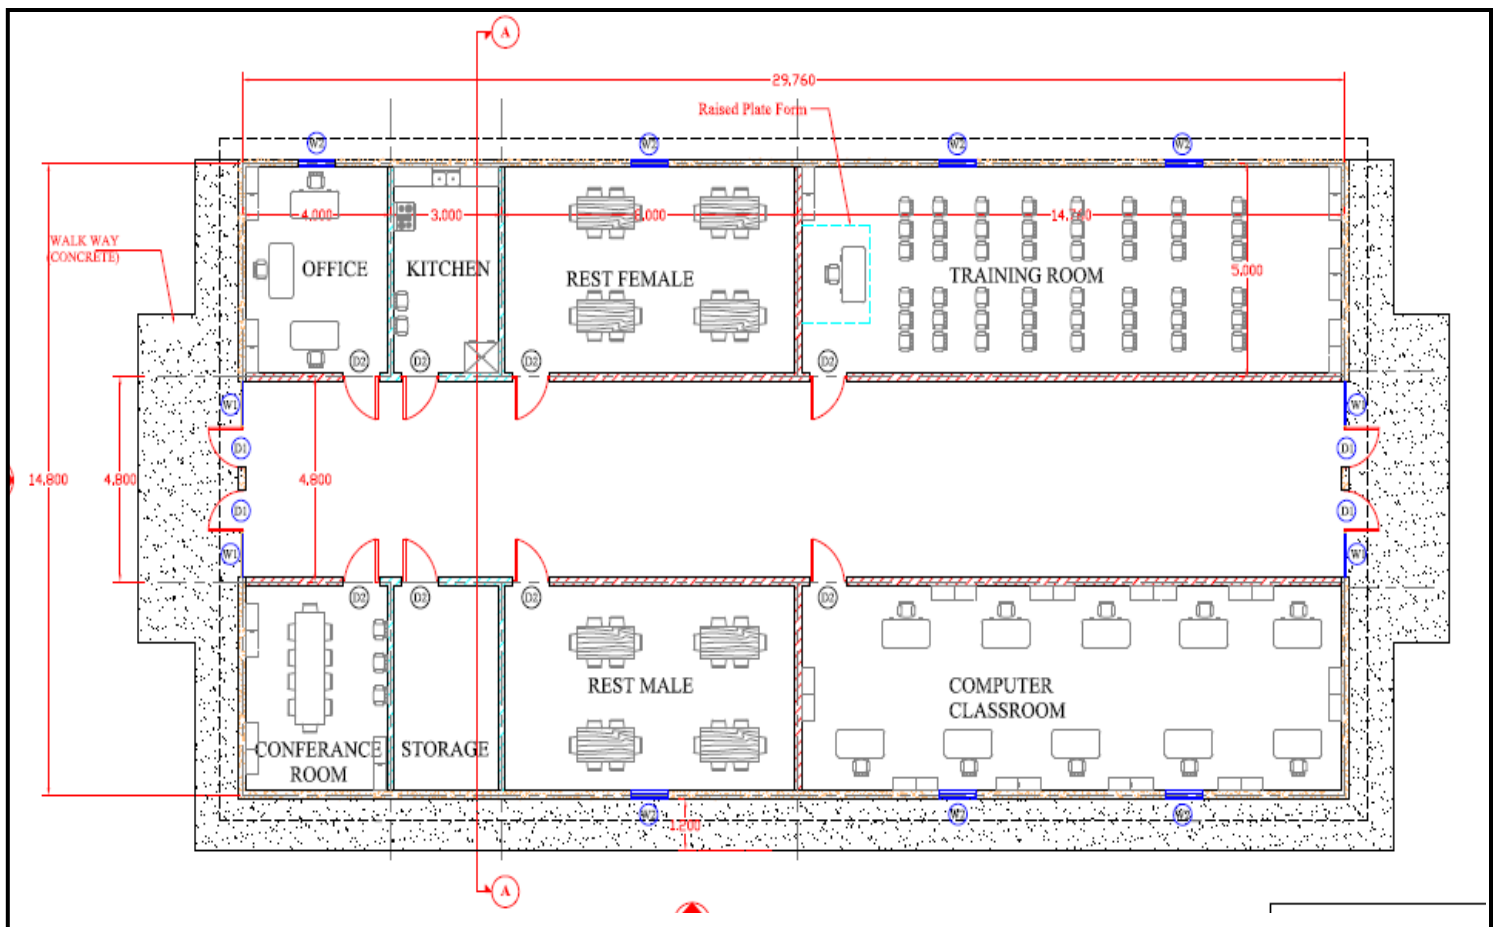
Design for turning previously existing open bay into multiple rooms (Courtesy of GRC)
